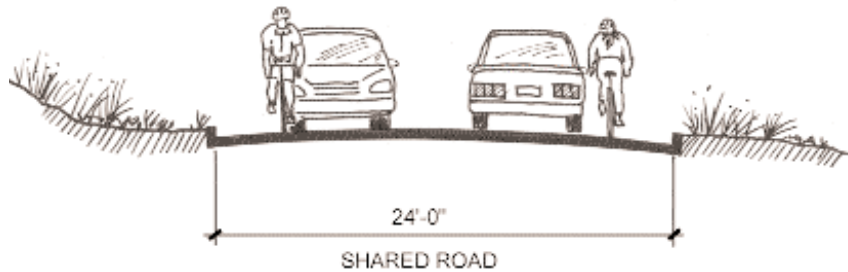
Existing Condition of Juan Bautista de Anza Trail at Battery Caulfield Road
